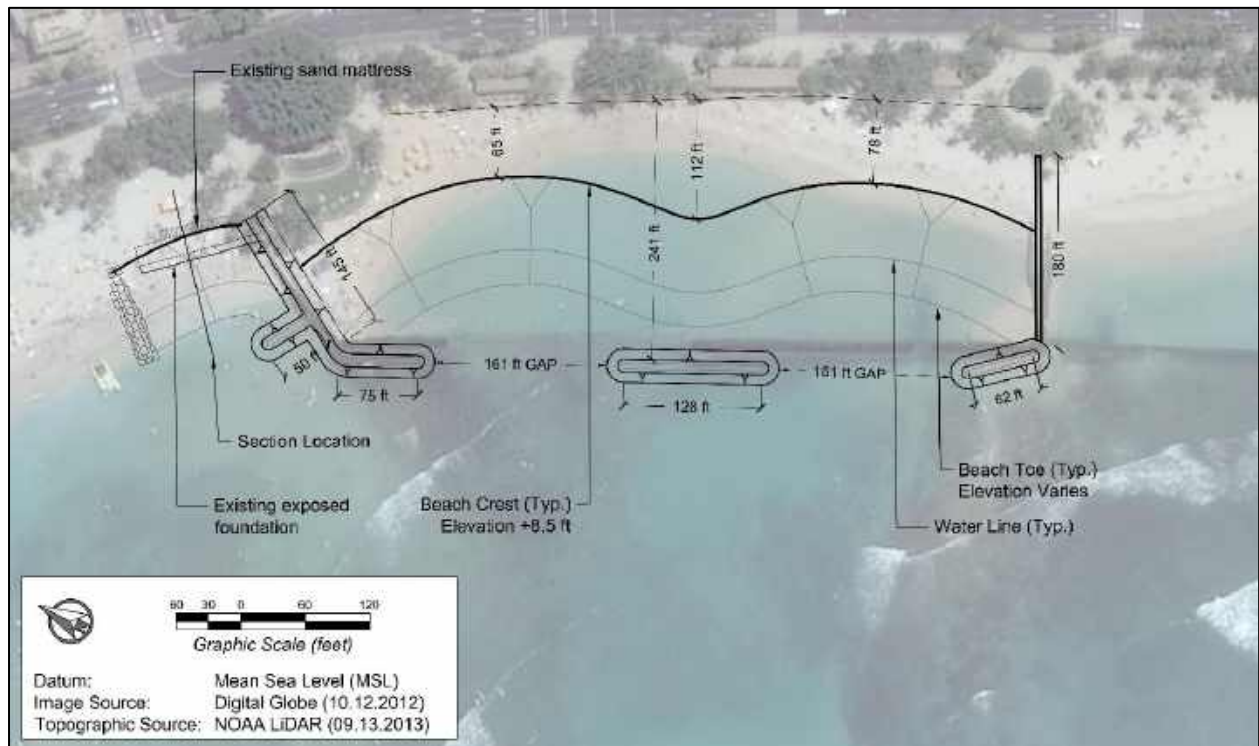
Conceptual layout for proposed action - Kūhiō beach sector ‘Ewa (west) basin
